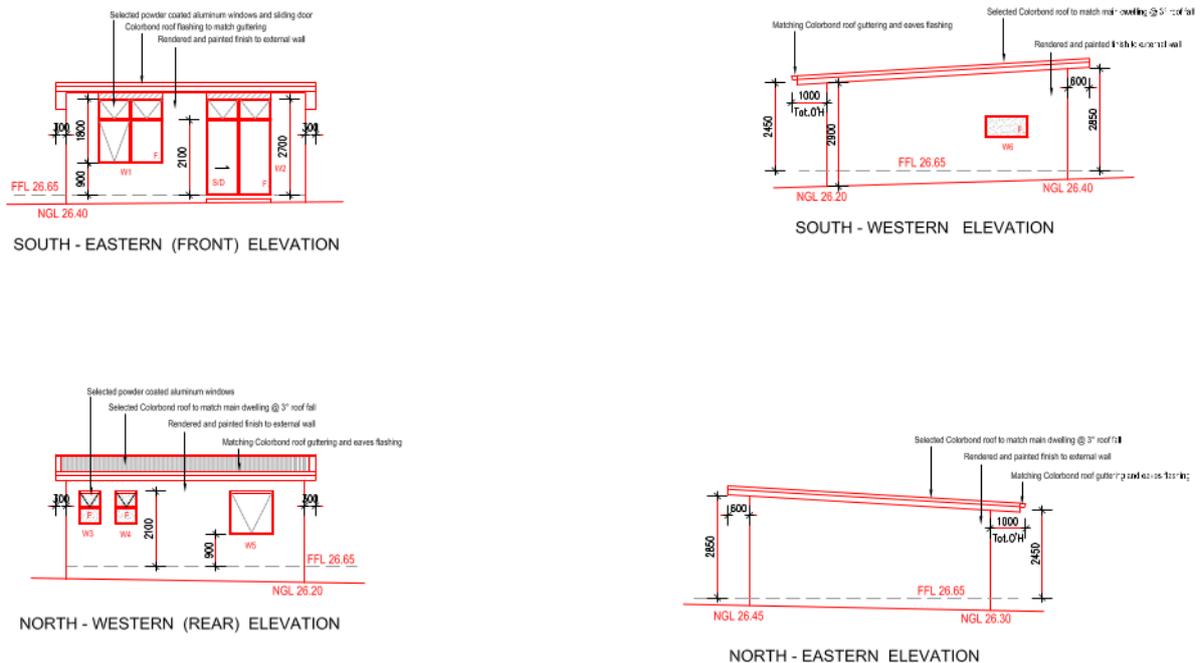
Extract of the elevations (source: Sabton & Son, drawing no. PR020.09 Page 03, dated 08/06/2020)
